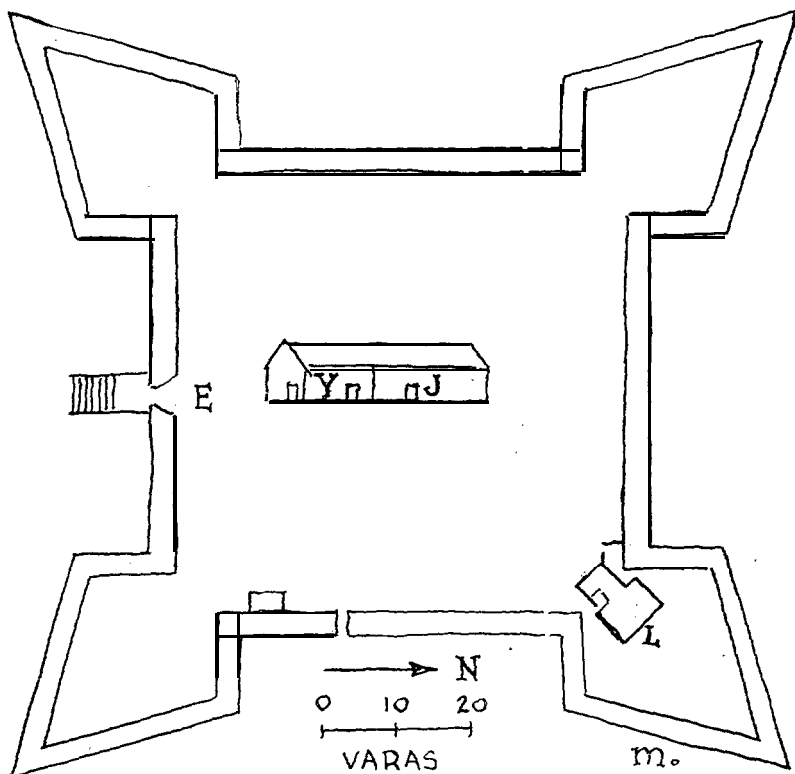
Plan 1680.* This untitled plan was enclosed with Salazar's letter of December 15, 1680, and is typical of several plans of the period which show the courtyard building in pseudo-perspective. E - Gate. Y - Guardroom. J - Storeroom made of stone and wood. L - Powder magazine.
